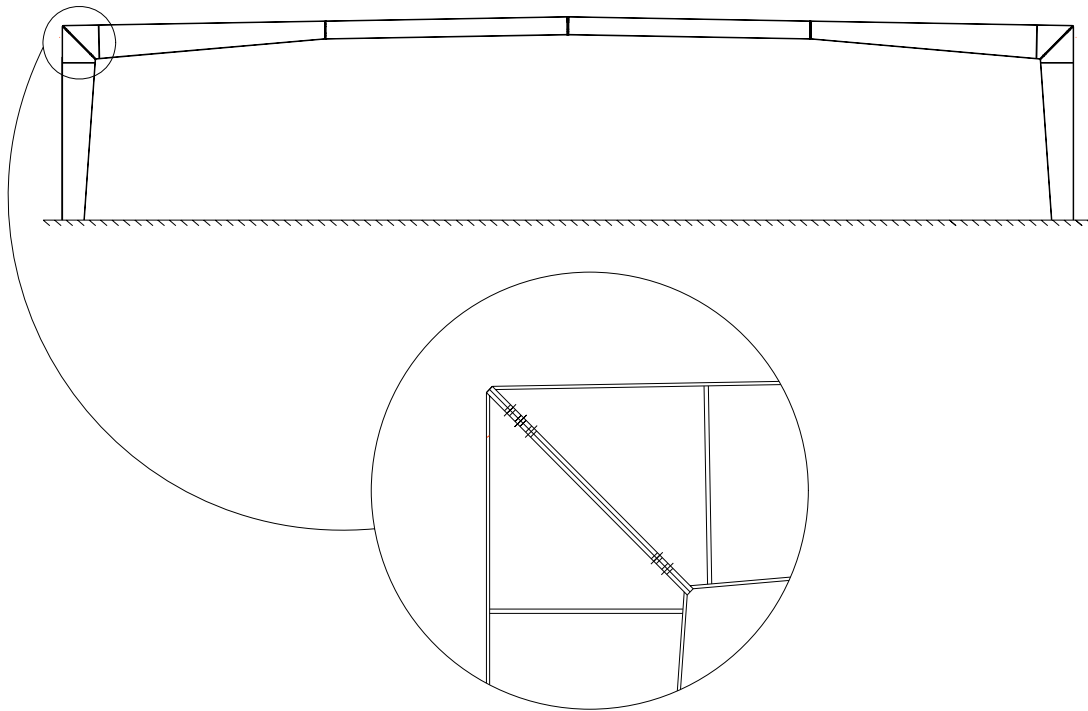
Typical Rigid Frame and Knee Connection Detail
